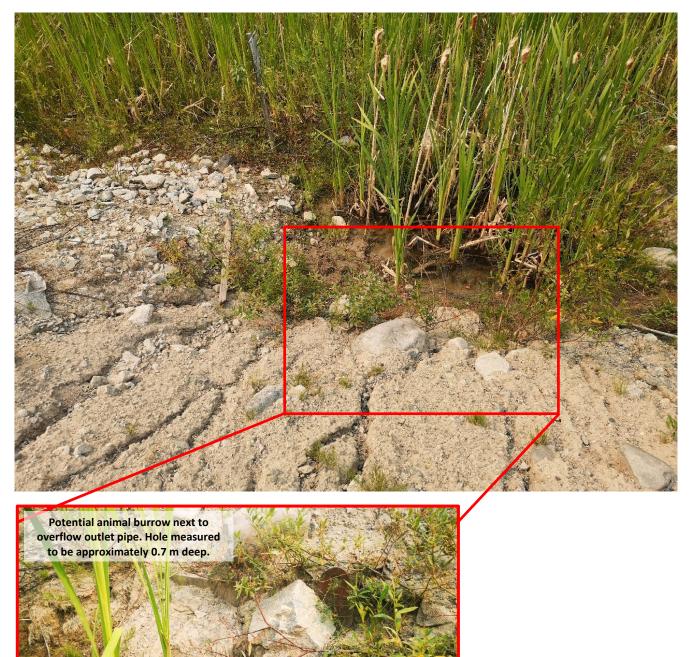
S5 Pond: Overview of downstream slope and S5 Overflow outlet pipes daylighting at toe, looking east (HGH-2021-36).
